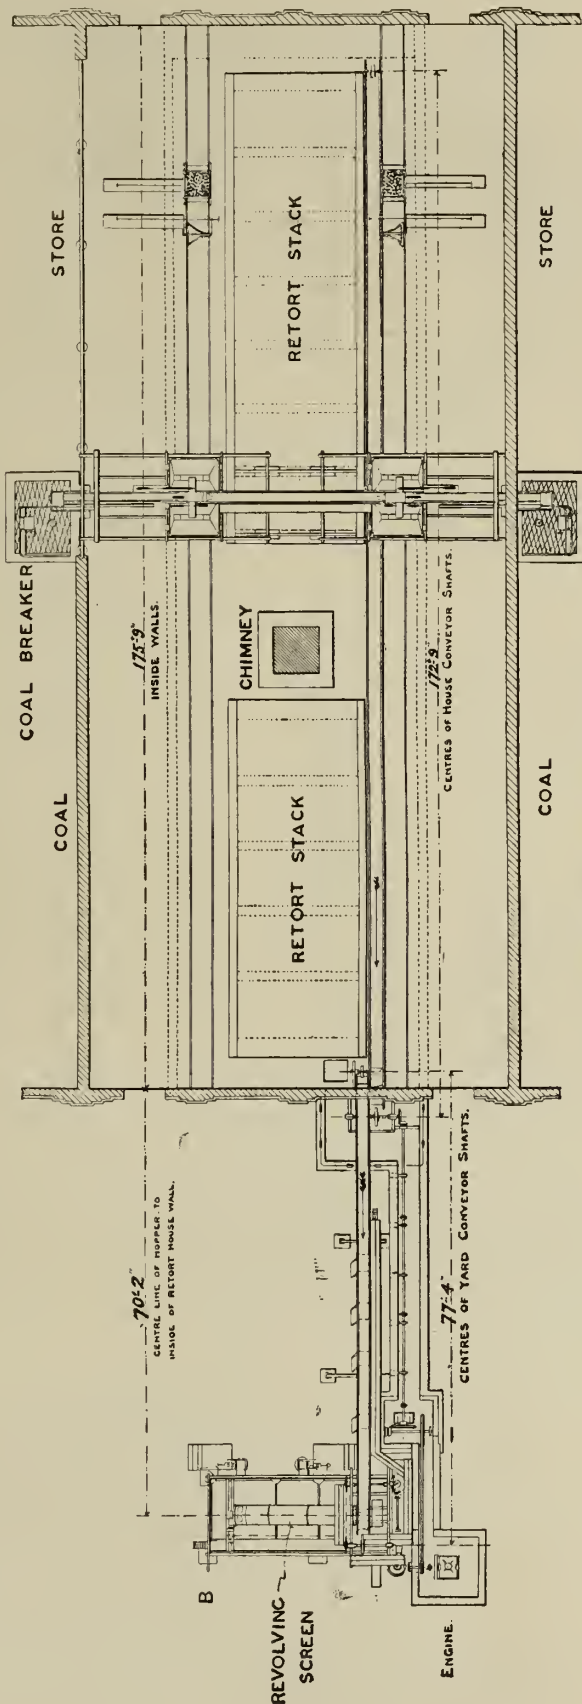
Plan of the Retort-House and Coal-Stores.
